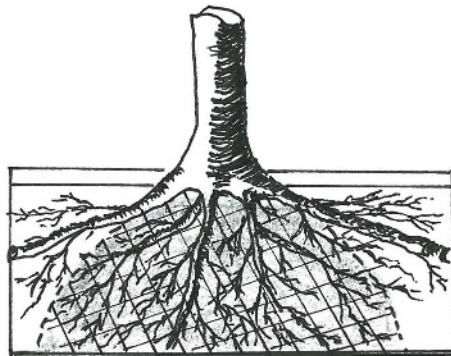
Tree pit design: Options for planting pit where site constraints are non-existent or minimal
